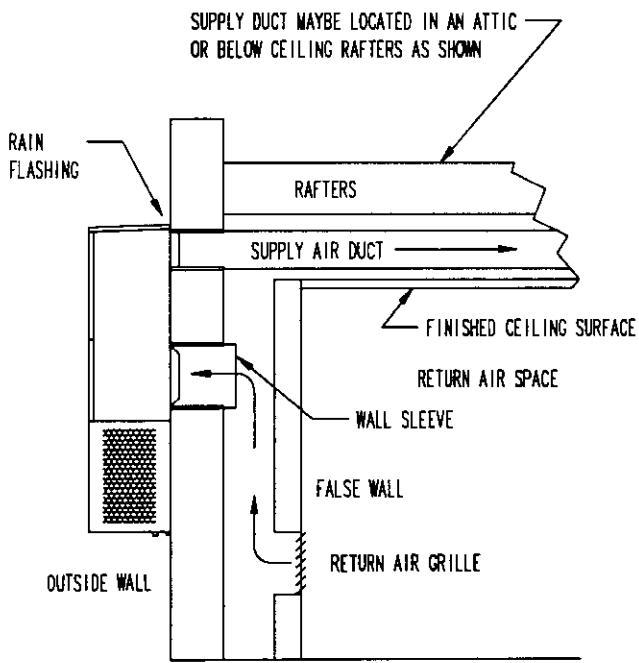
COMMON WALL MOUNTING INSTALLATIONS
